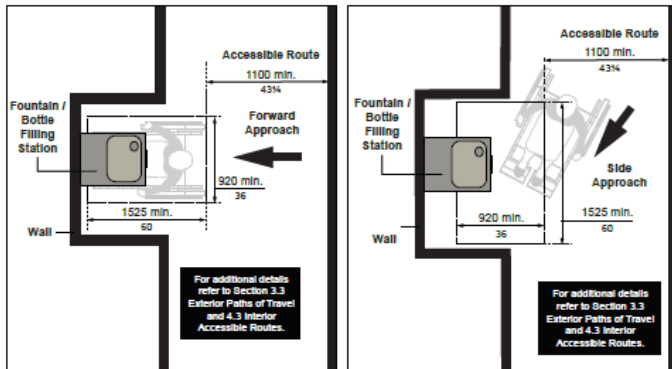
Clear Floor Space Requirements and Approach at Recessed Drinking Fountain / Bottle Filling Station - Plan View
